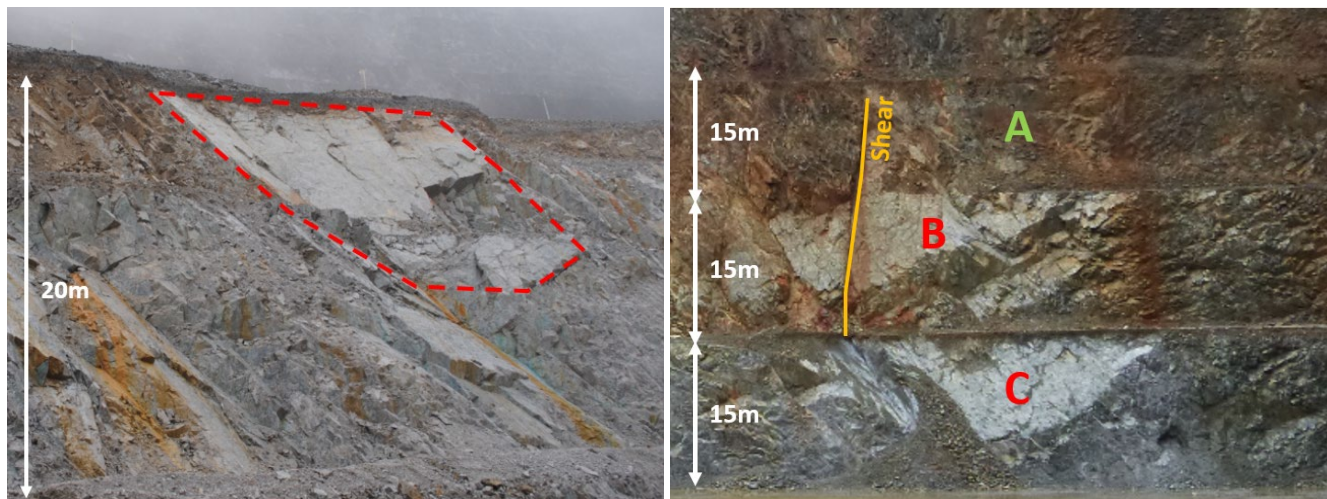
Q-slope application examples relating to Table 10. Left: Example for plane failure. Right: Example for wedge failure 'B'
